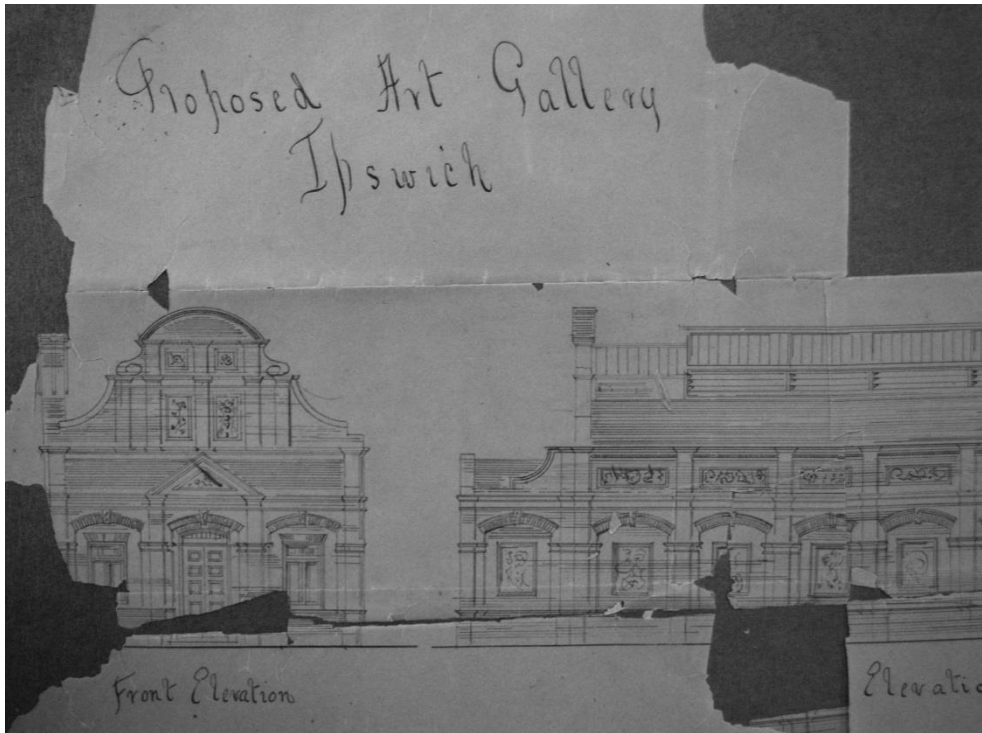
1879. Detail from plans for the new Art Gallery (Suffolk Record Office, drainage plan no. 1323). Front and part of side elevations.
